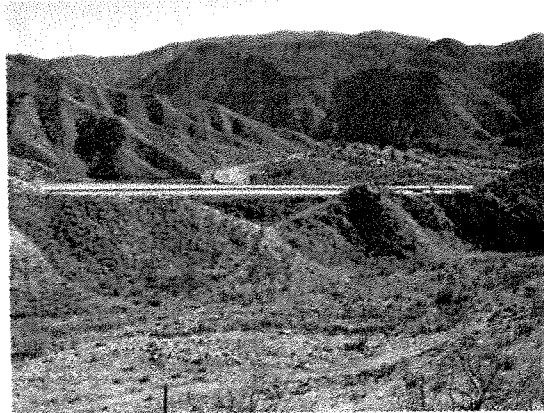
Removing the fill slope under SR-14 would route Spring Canyon to Bee Canyon and the Santa Clara River.
